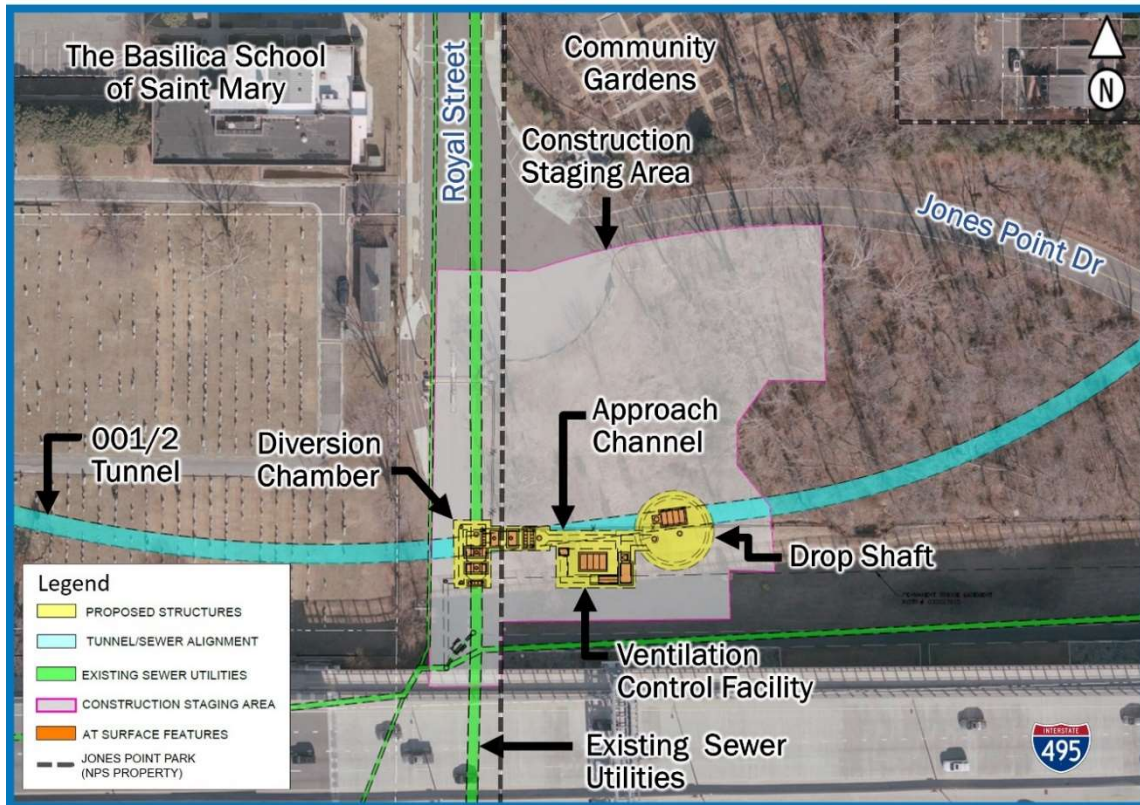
Royal Street South Diversion Facility (pairs with Church Street Alignment)
